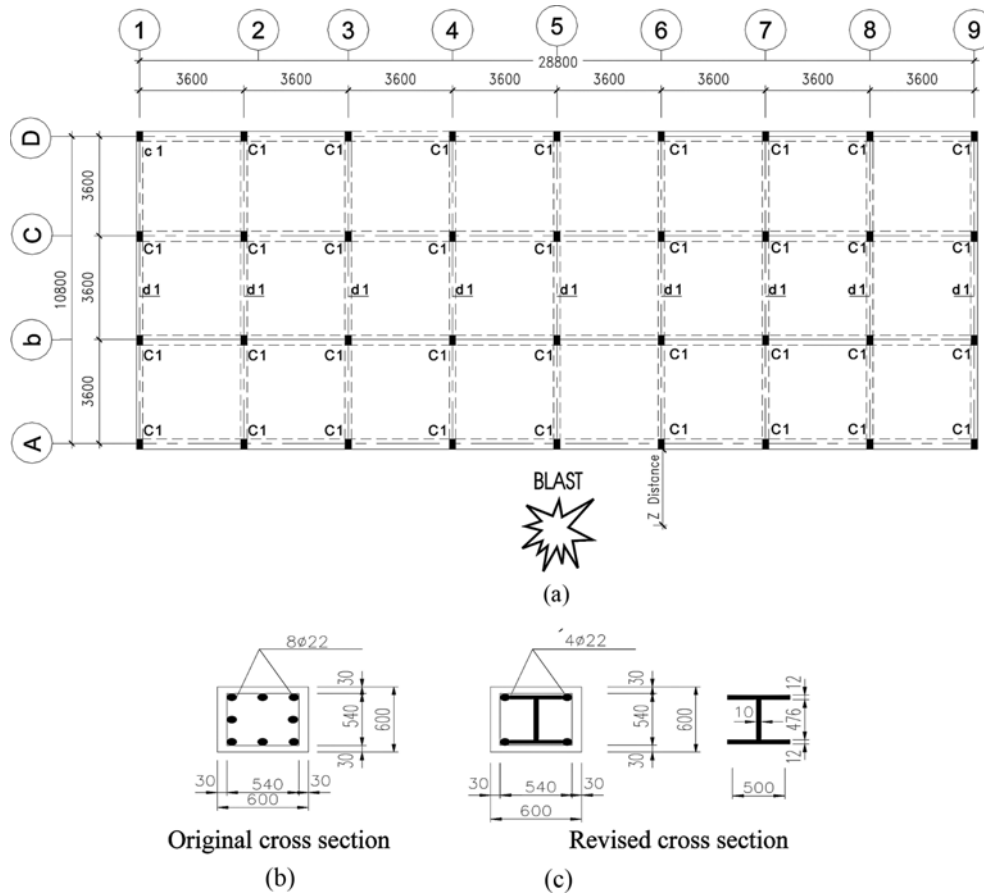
Base Layout of the Building: (a) Typical Structural Floor Plan, (b) Original Cross-section, (c) Revised Cross-section of the Column
